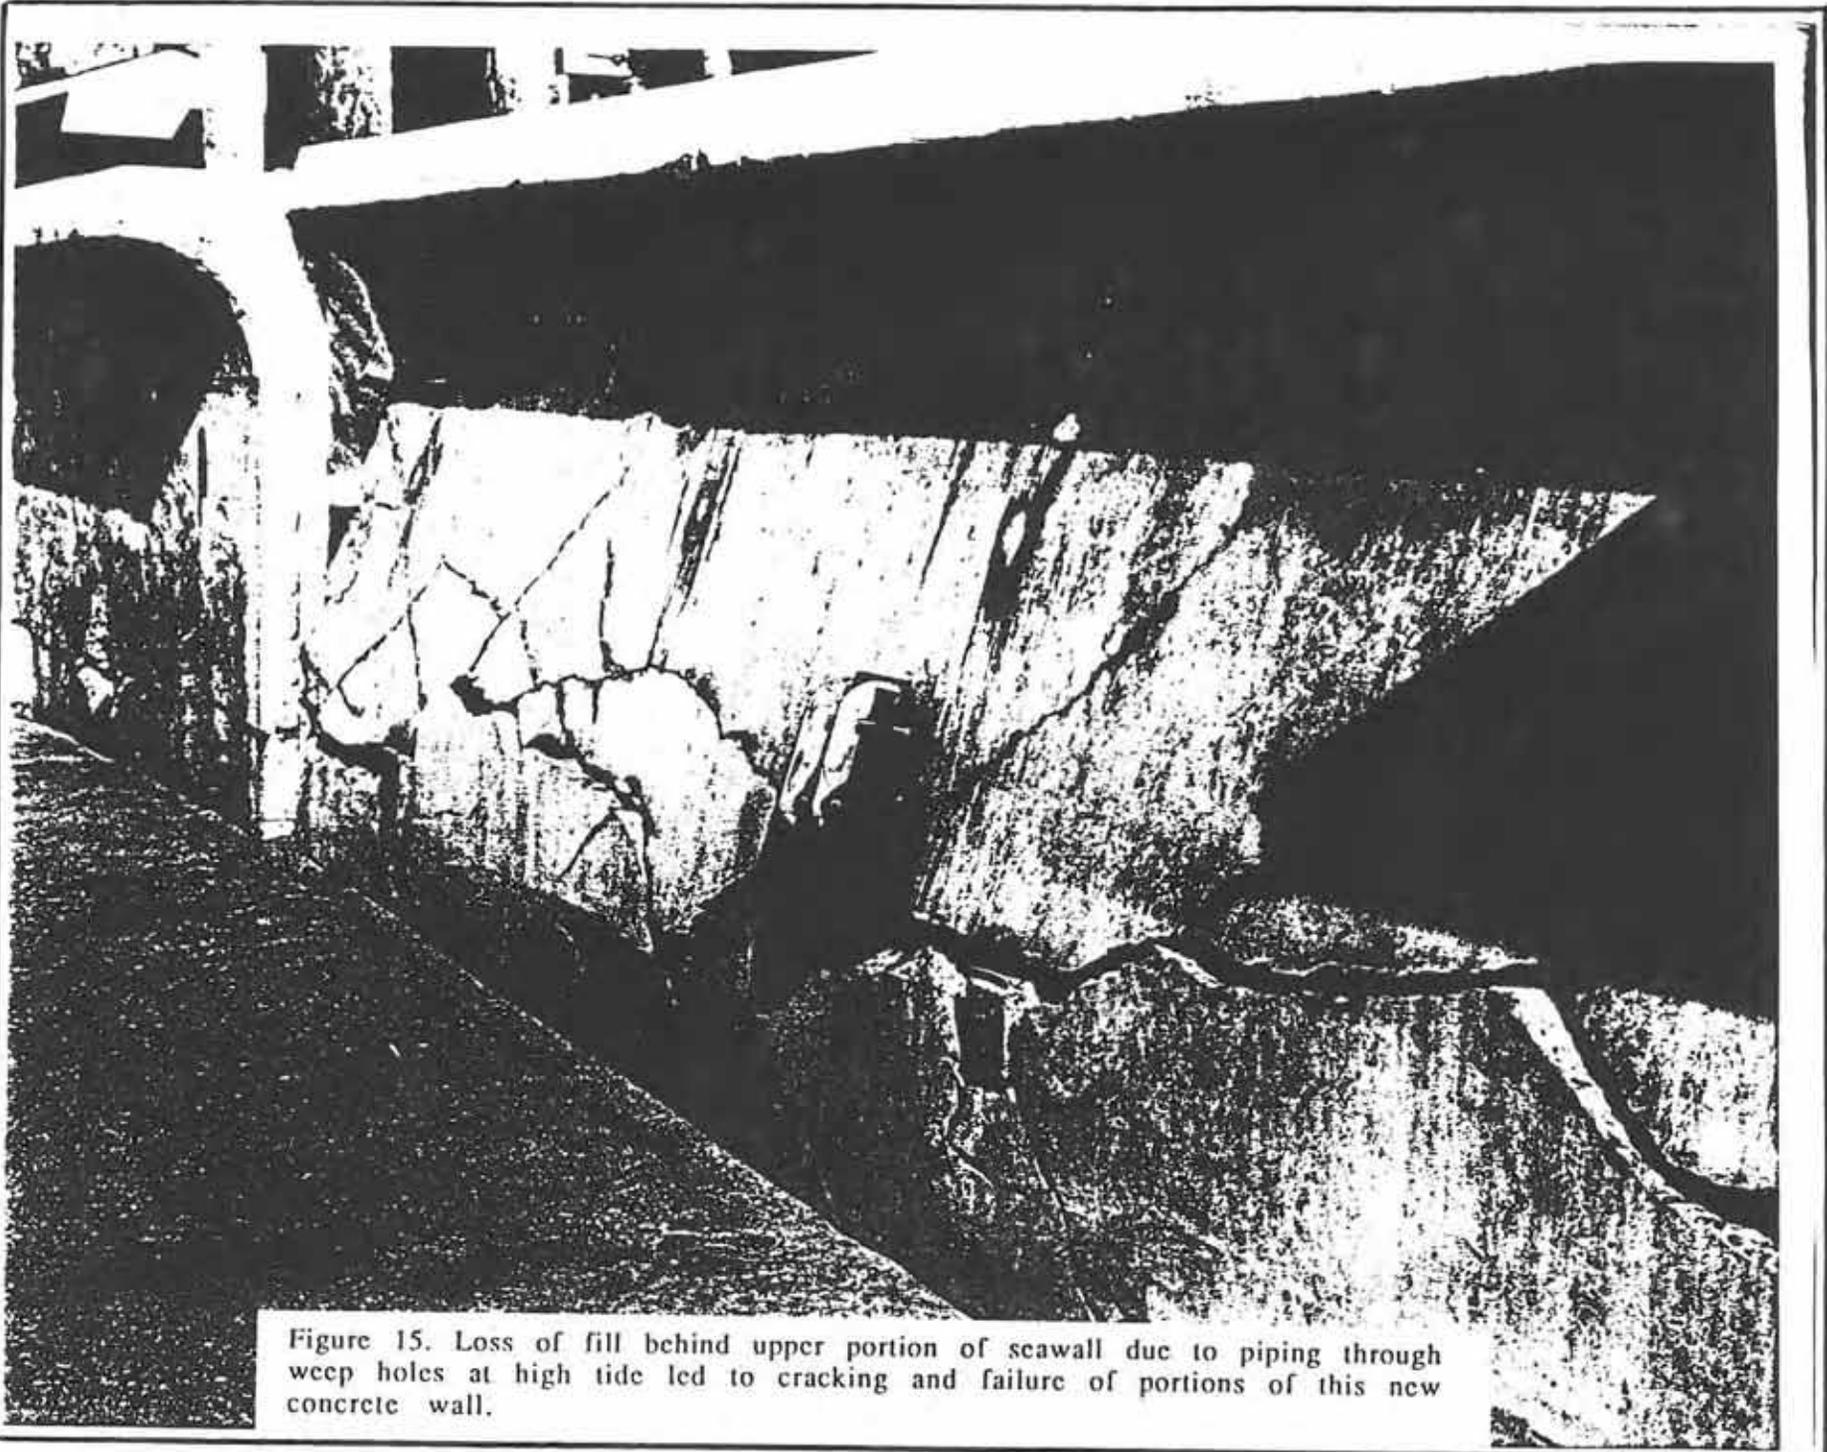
Loss of fill behind upper portion of seawall due to piping through weep holes at high tide led to cracking and failure of portions of this new concrete wall.
